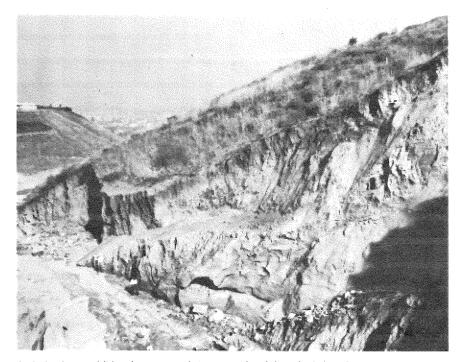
Landslide plane exposed in east side of breach, believed to be part of slide encountered during construction of dam.
